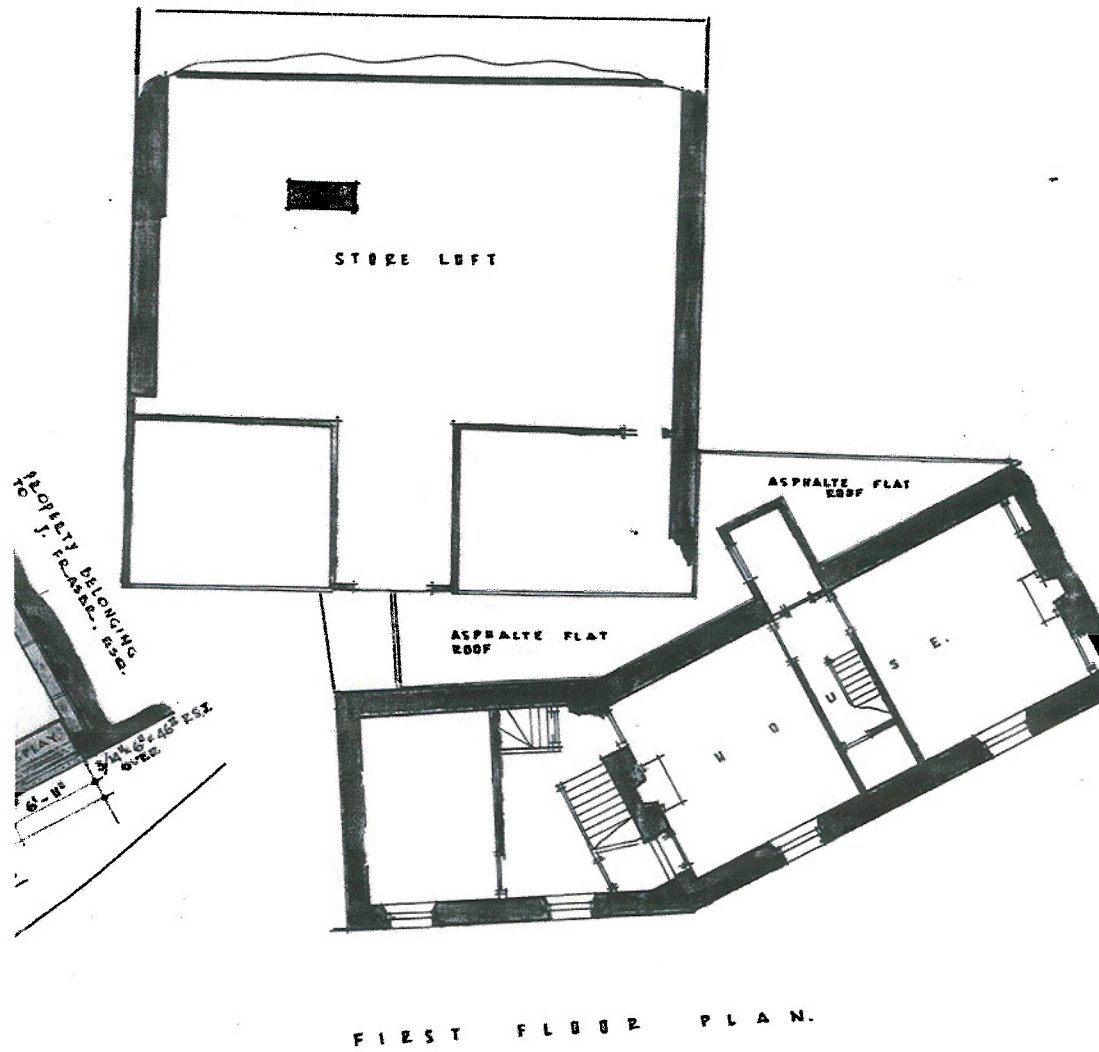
Existing 1st Floor Plan 1953 scale 1/8" - 1ft.
